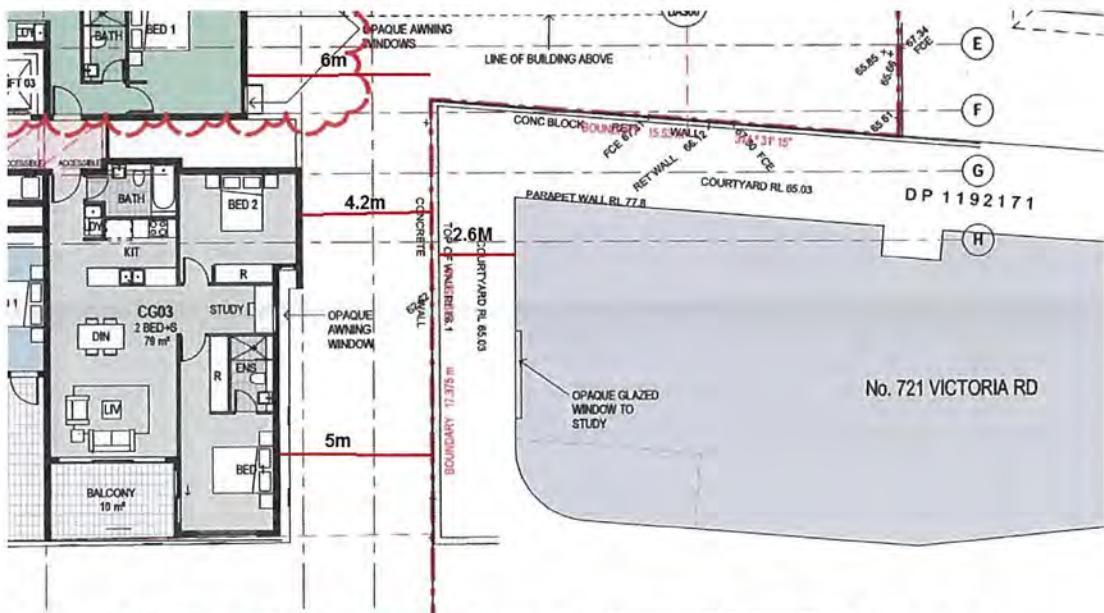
separation between adjoining site at 721 Victoria Road. One window facing 721 Victoria Road which is off a study area and has opaque glass.
